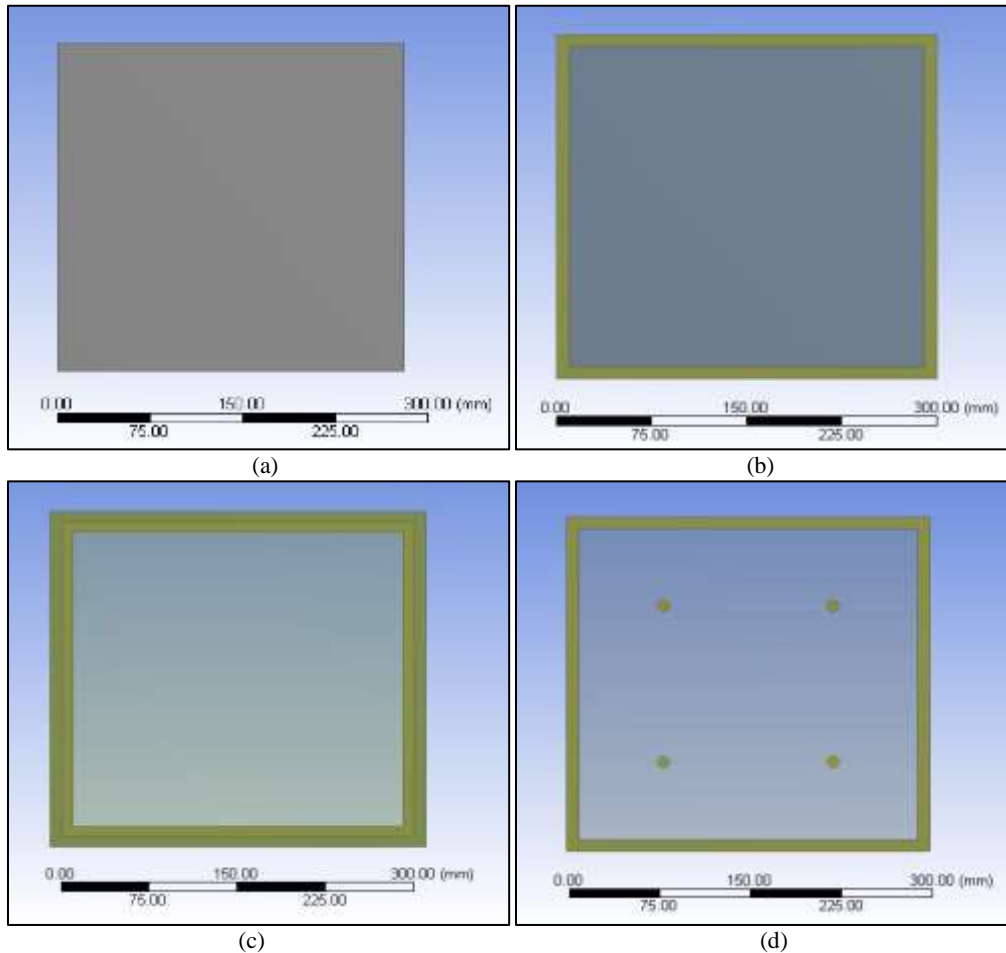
(a) Basic structural beam (b) Beam with one FRP layer (c) Beam with two FRP layer (d) Beam with one FRP layer and reinforcement
